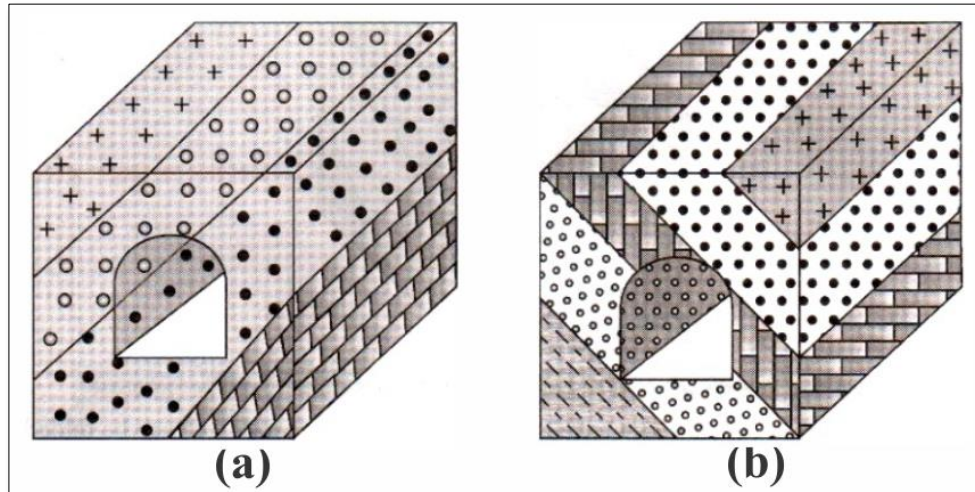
Tunnel parallel to strike of rocks dipping sideways resulting into loading of left (a) and right flank (b) of tunnels loading the back corner and wall of tunnels.
